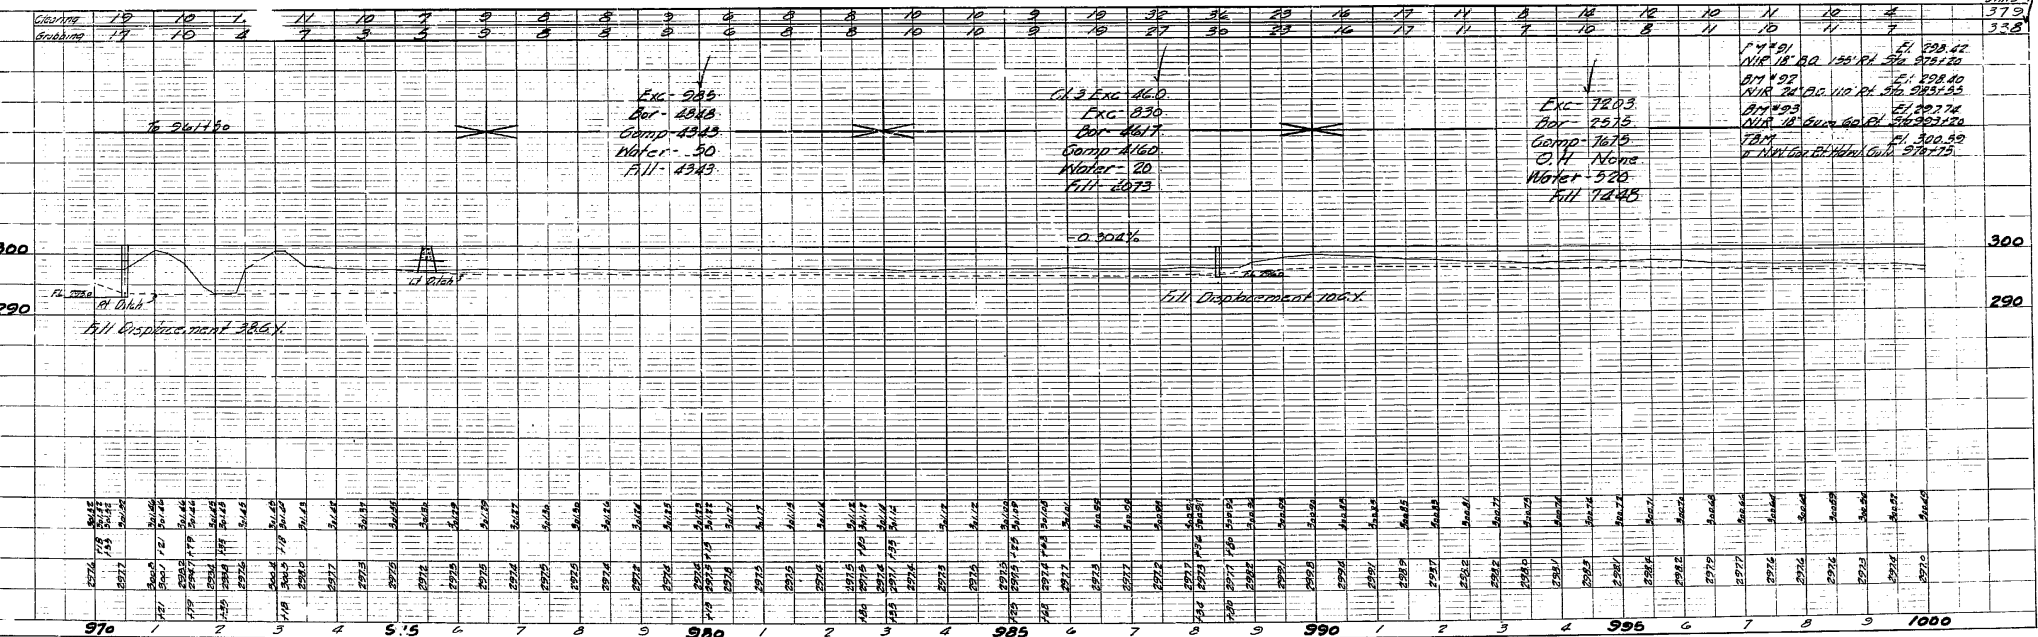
PLAN - PROFILE OF ROAD & STRUCTURES
